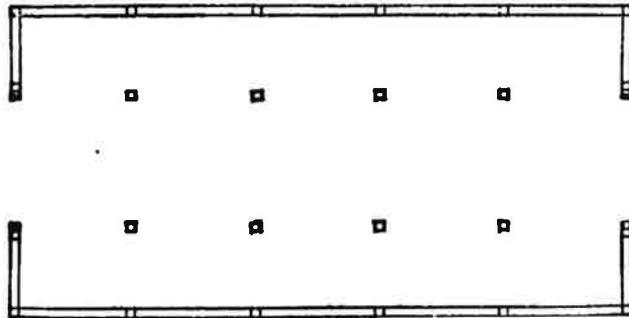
GROUND PLAN OF SHEEP BARN.
